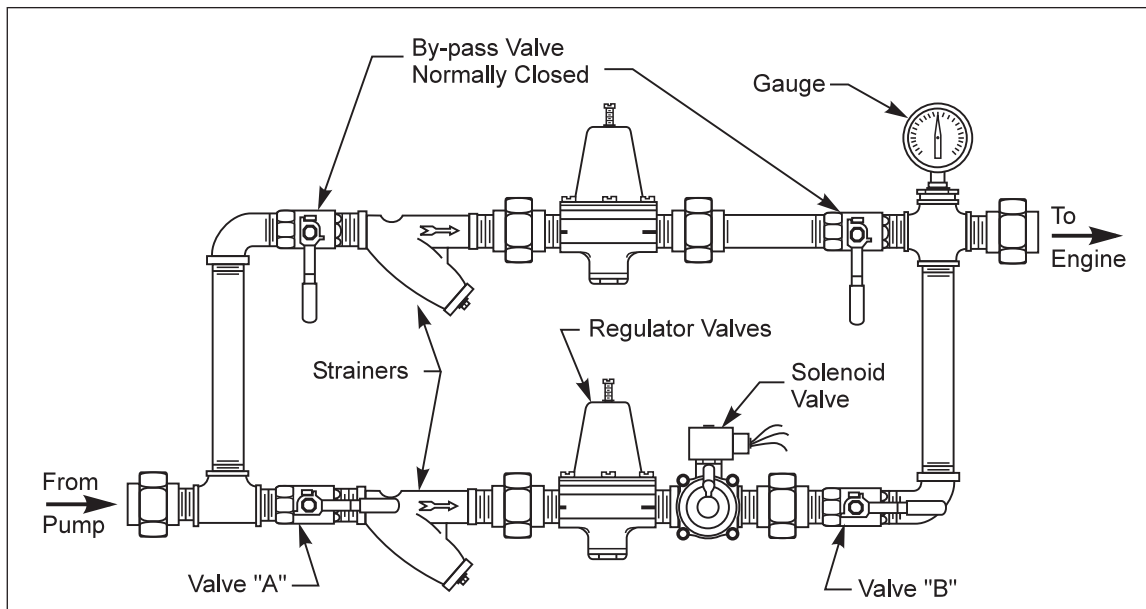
Diagram of a typical heat exchanger cooling water piping arrangement.
